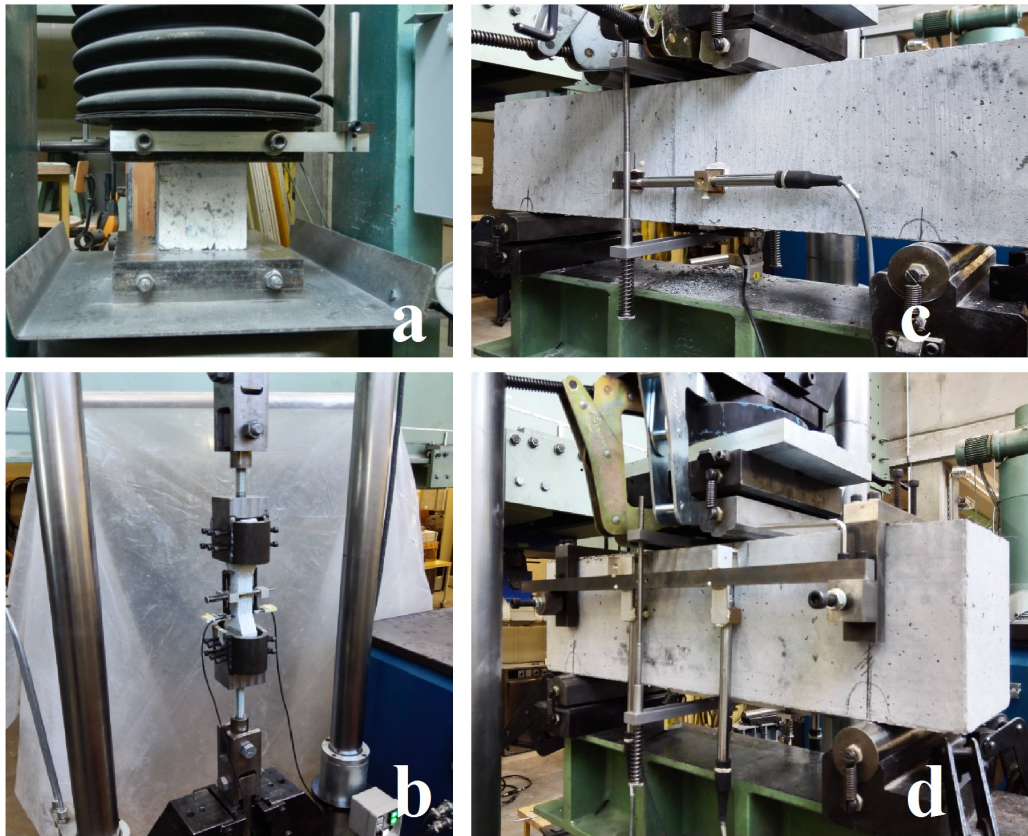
Test machines: a) Machine Perrier type 138-5000 kN used to perform compression tests on cubic specimens; b) Machine Walter Bai type LVF-200 kN used to direct tensile test; c) four-point bending test on notched beams; d) four-point bending test on un-notched beams.
